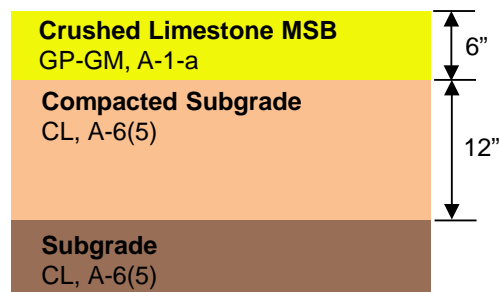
Pavement foundation profile on 1st St. North and South test sections
